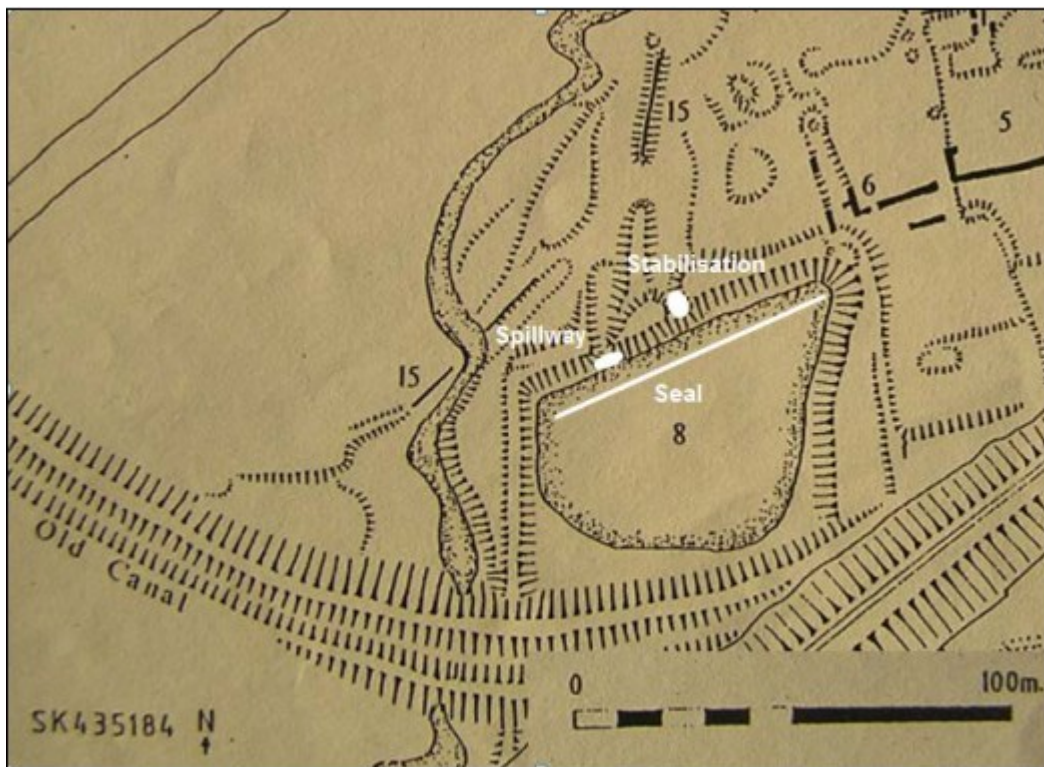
Locations for sealing the northern bank, construction of spillway & stabilisation of outside embankment
